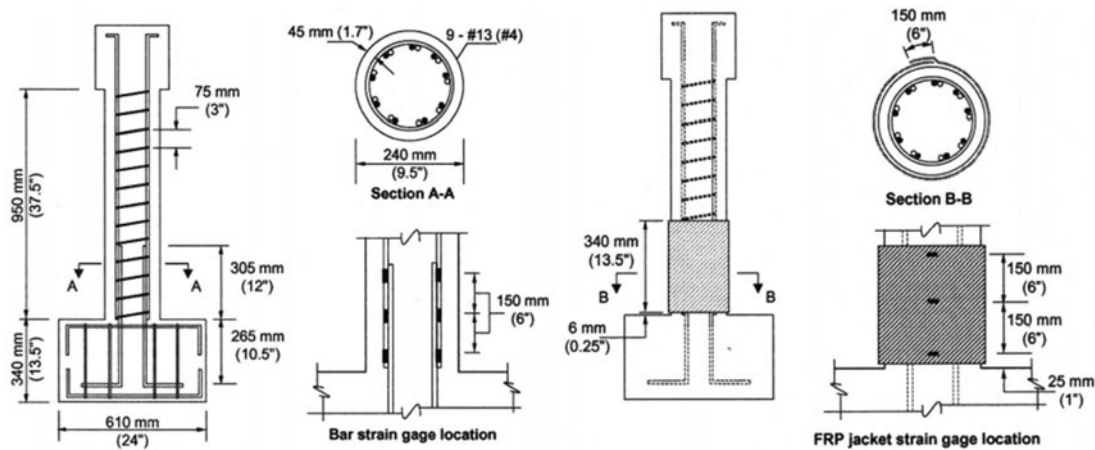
Reinforcement detailing and FRP strengthening of the tested columns (Breña et al., 2007)
